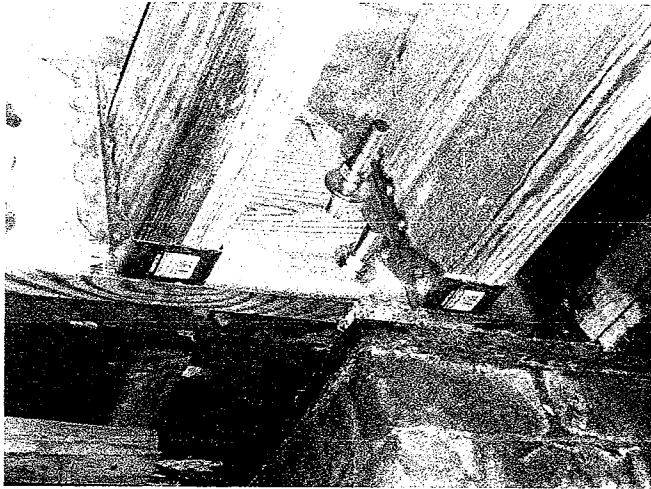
Bolts connecting ledger at entrance grid B/9 not yet tightened.
